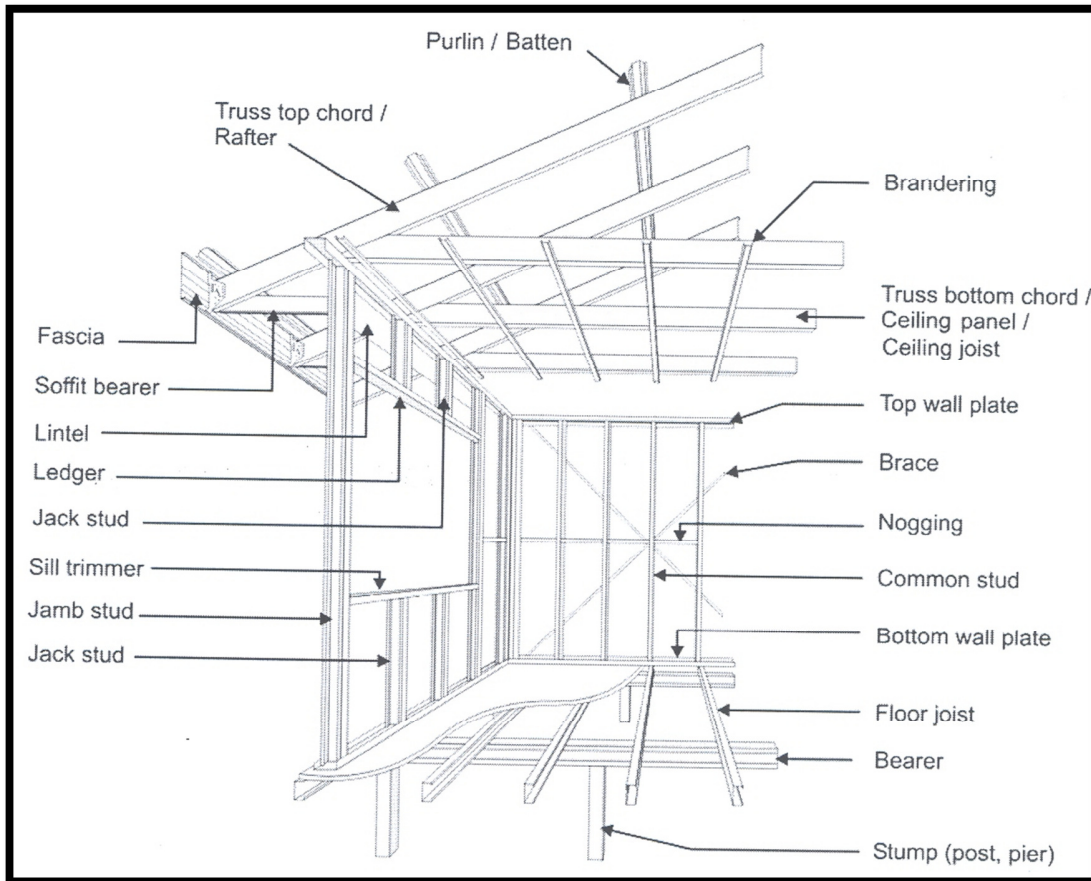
Typical elements of a steel framed house (SASFA, 2010)
